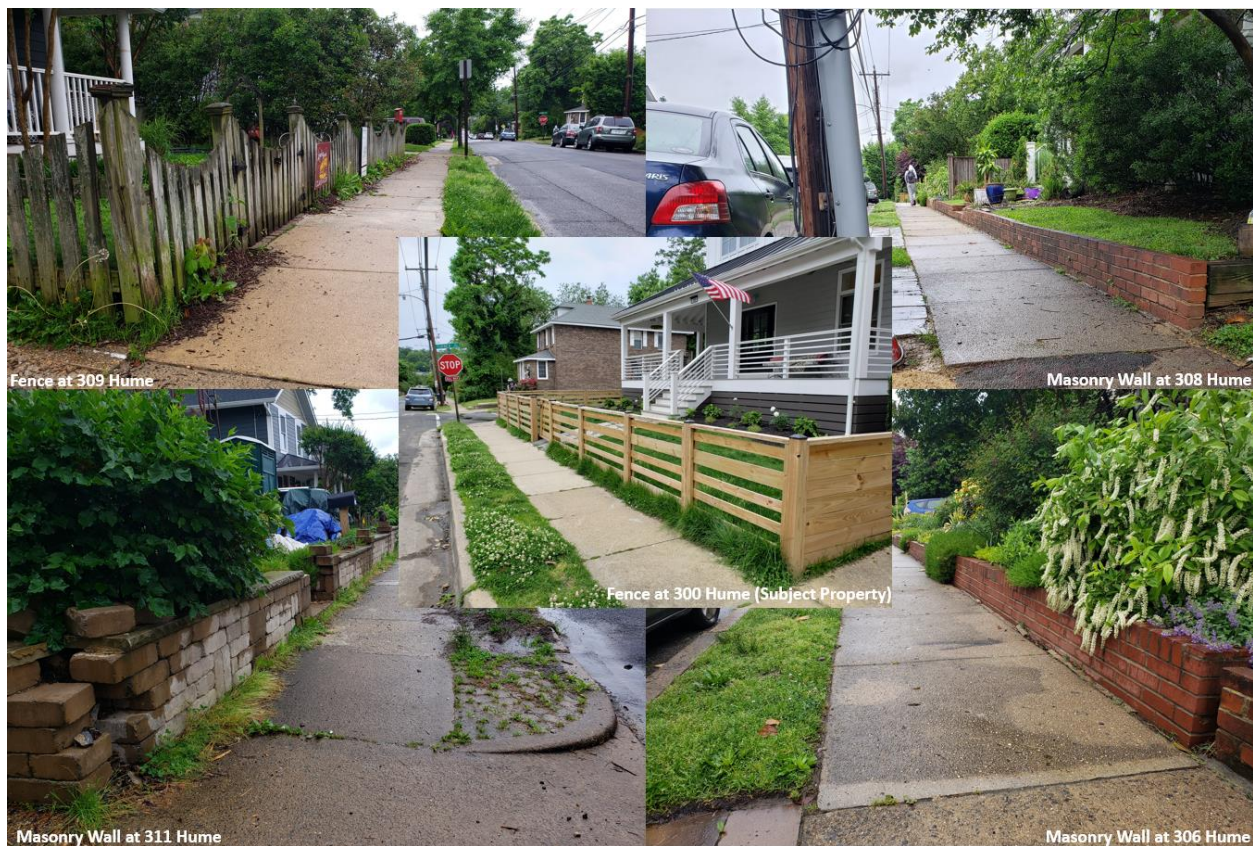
Fences and Masonry Walls Along Sidewalk on 300 Block of Hume Avenue
